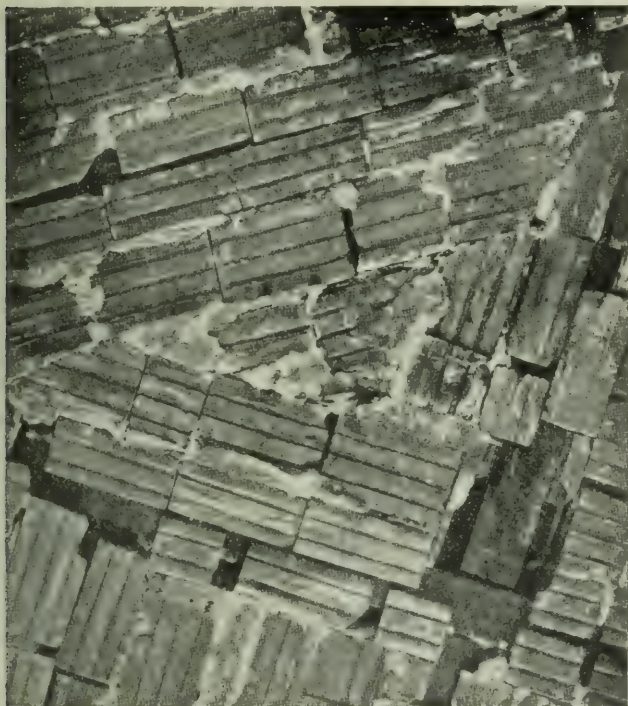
Defective Workmanship in Fireproofing with Hollow Clay Tile. Note Broken Tile, Open Joints, and other serious Breaks in Protective Covering.
